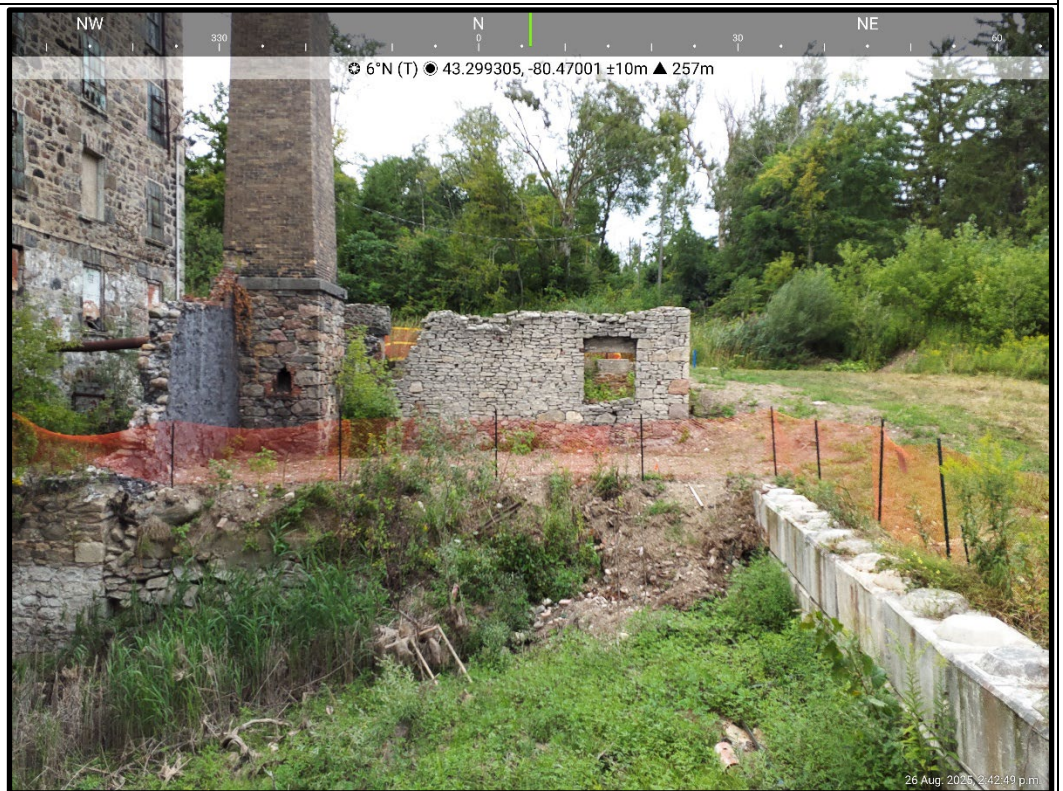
Aug 26, 2025 The former spillway on the east side of the mill looking north-northeast towards the right of way.
